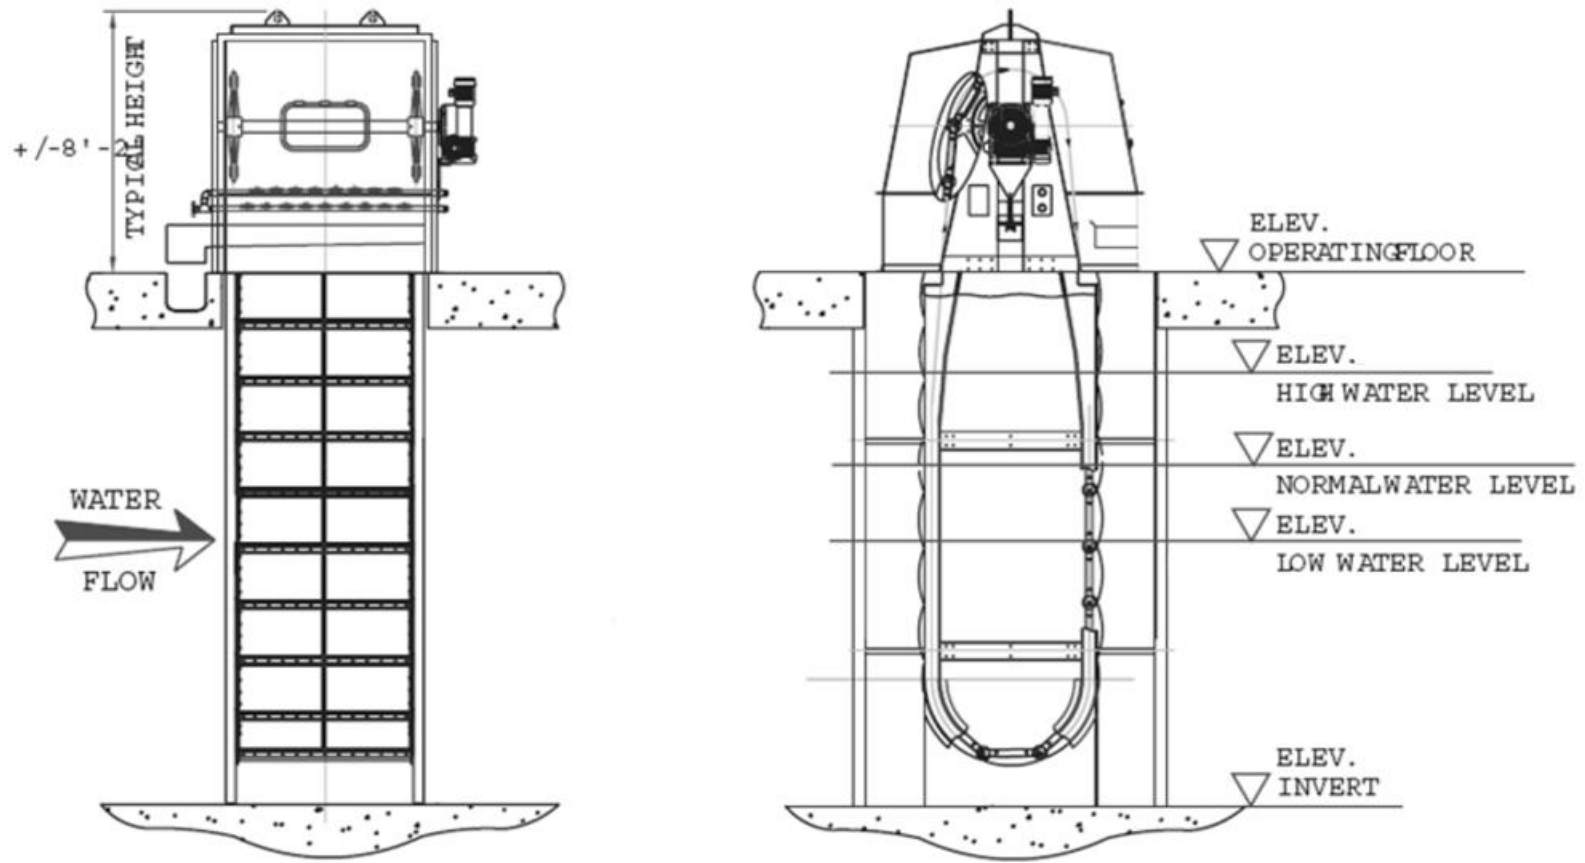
Typical Dual-flow Screen – Section and Elevation (Bracket Green 2007)
